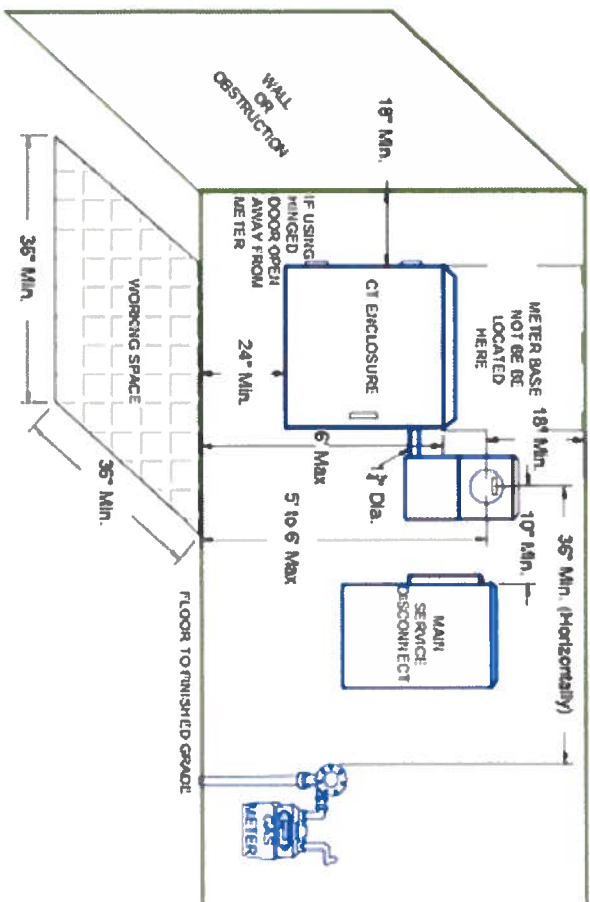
Meter base height, minimum clearance, and gas meter clearance.
